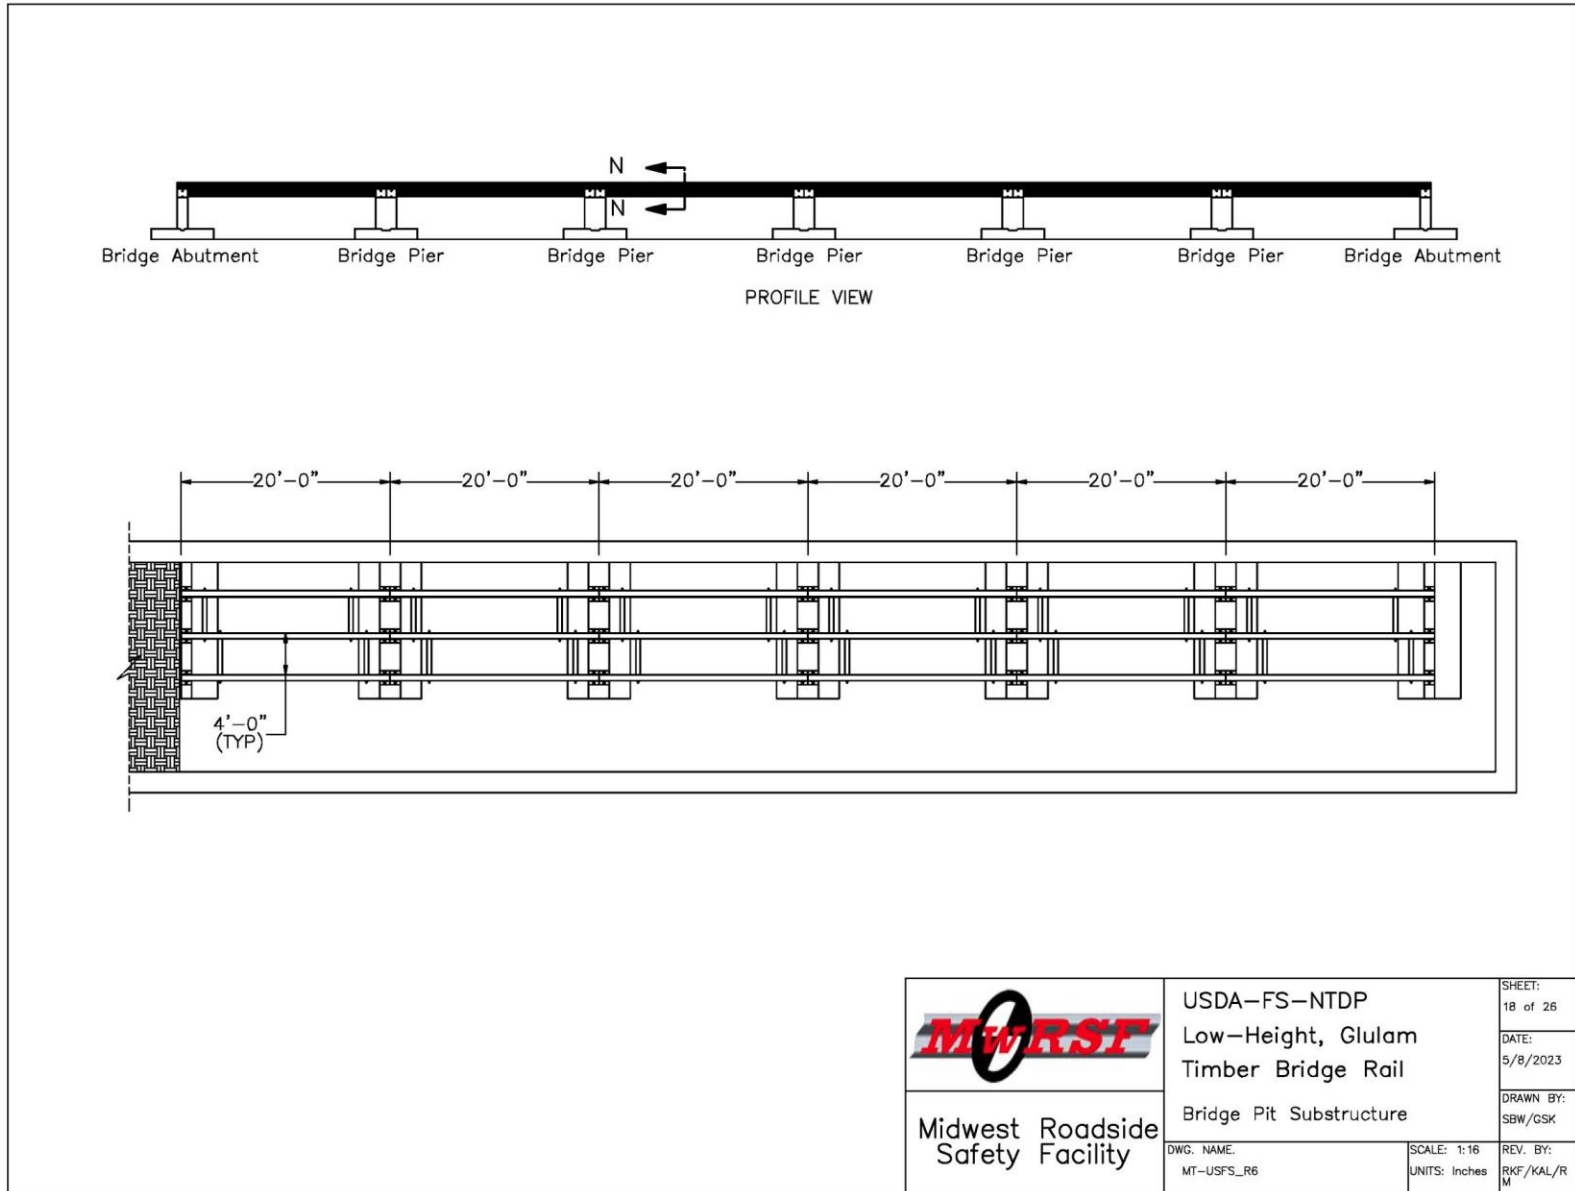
USDA-FS-NTDP Low-Height, Glulam Timber Bridge Rail: Bridge Pit Substructure
